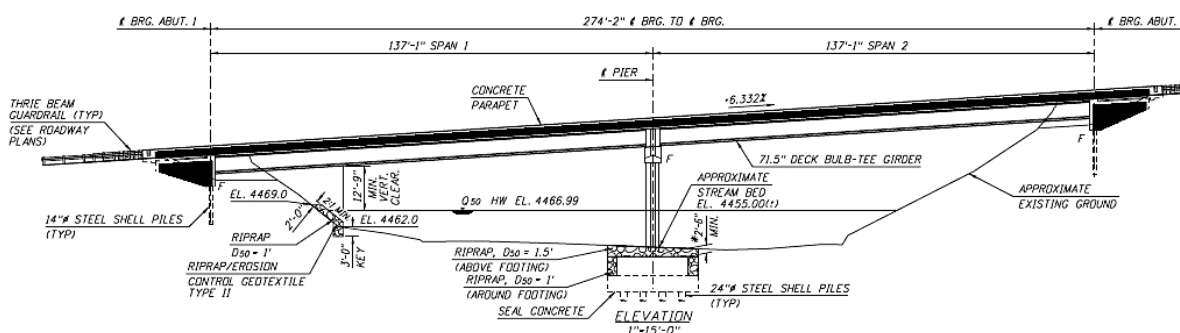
Elevation view of the new design of the SH-36 Bridge over Bear River (NTS).
